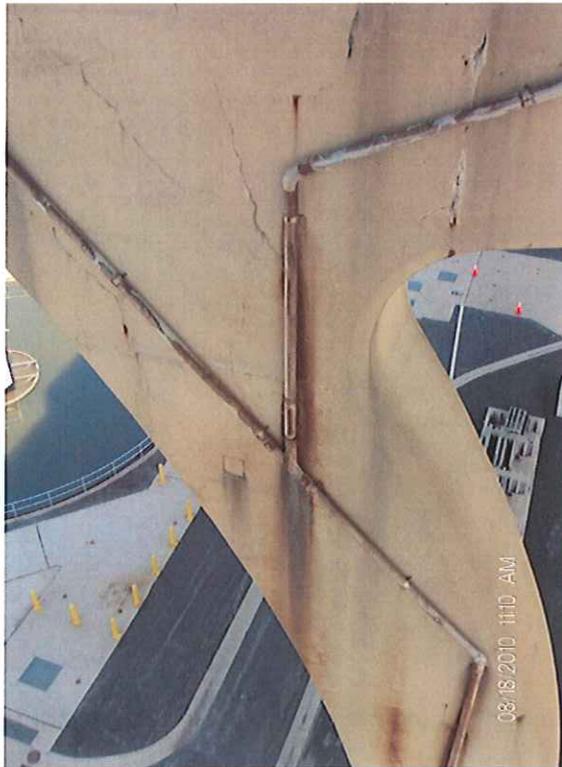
Pier 2S - cracks and leaking downspouts
